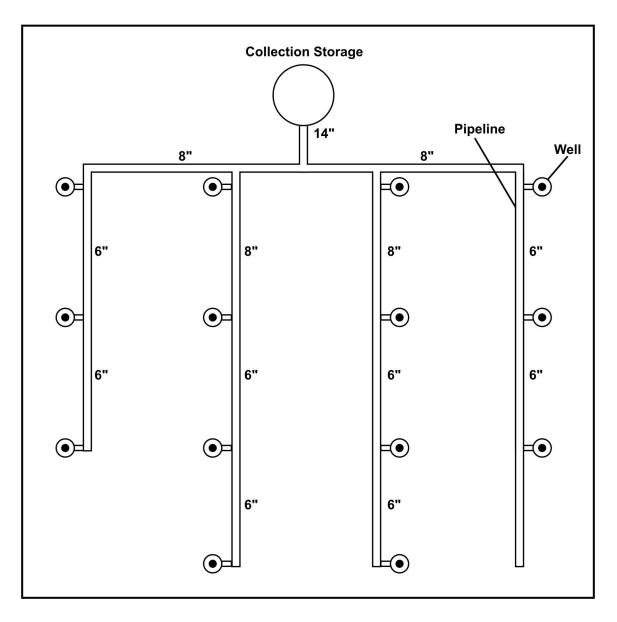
Example Well Field Layout and Design Using 3 MGD Parmer-Castro-Lamb Project
